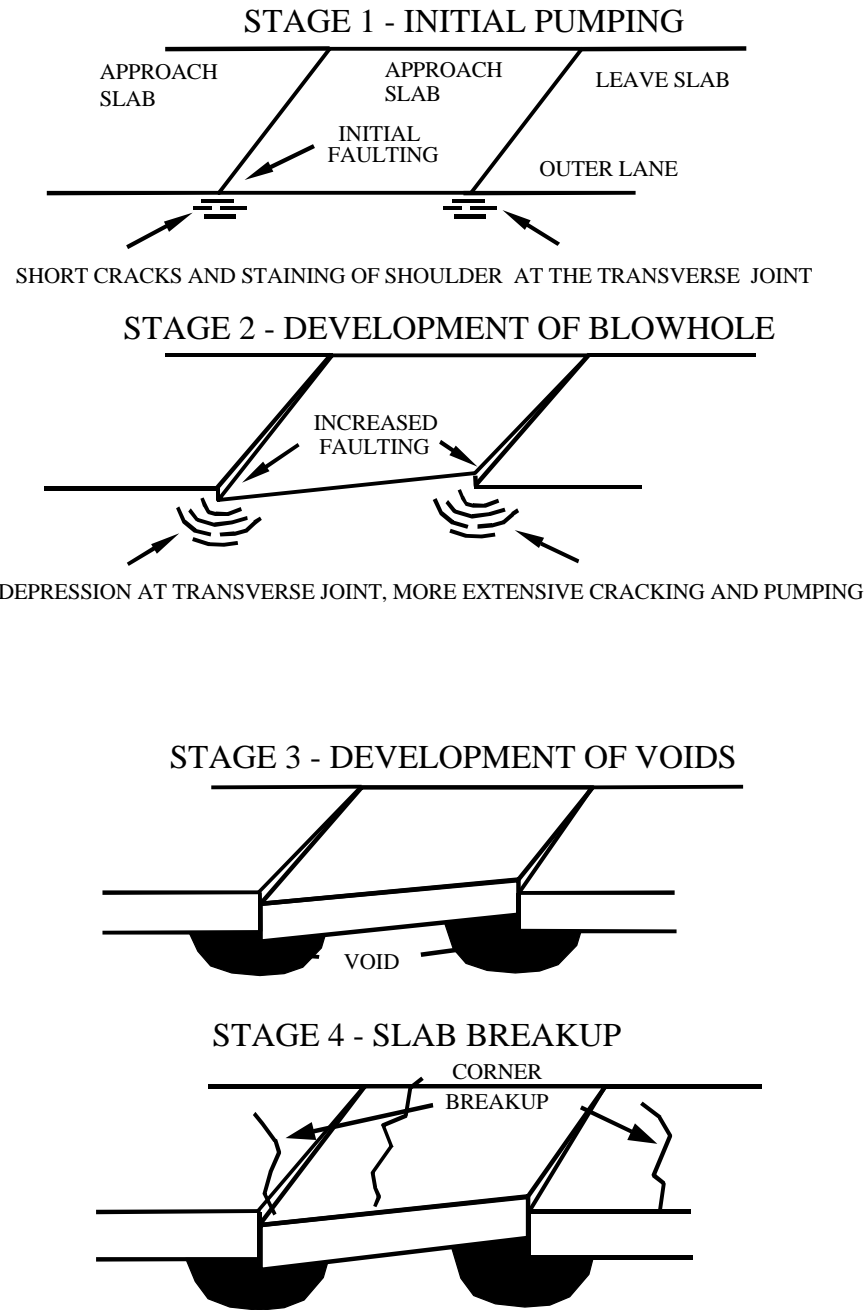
Typical stages in the deterioration of a concrete pavement.⁽⁶⁾
